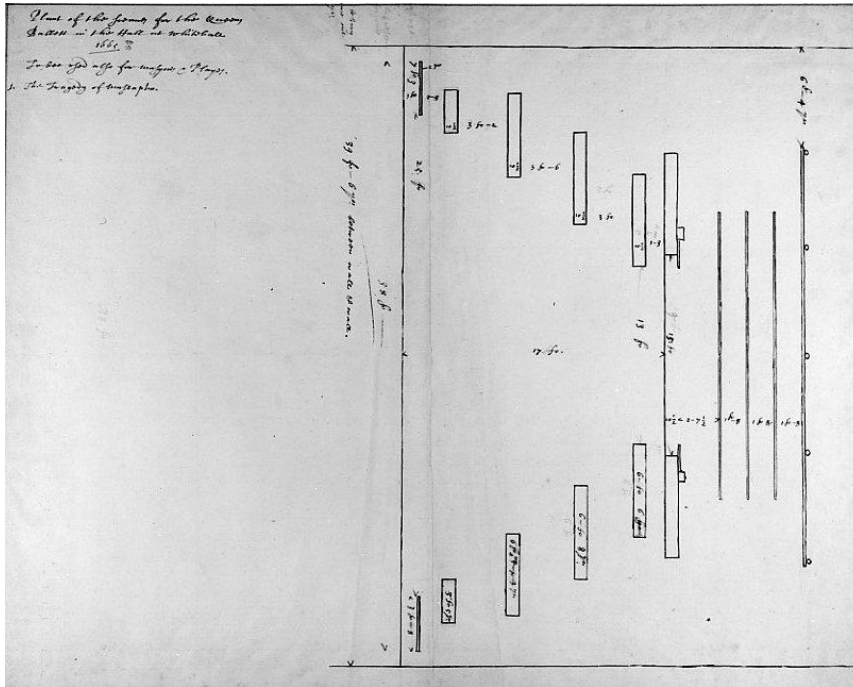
John Webb, Plan for the Tudor Hall Stage, Whitehall, 1665. Accessed from restorationstaging.com
